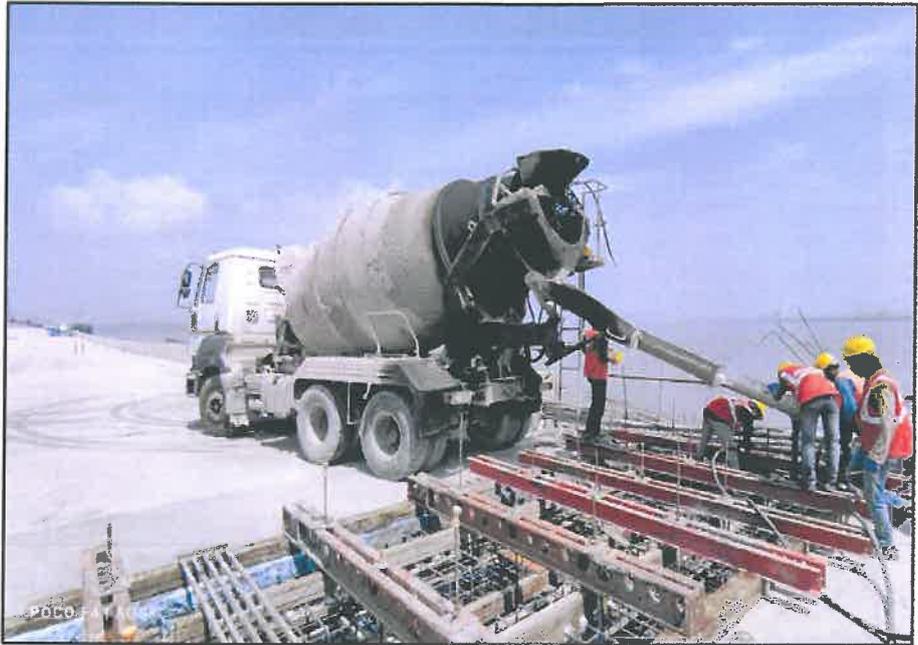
Expansion Joint Cantilever slab concrete in progress.
